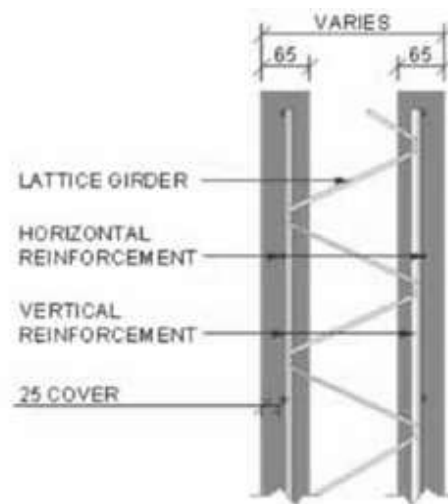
Twin wall section (adapted from www.doppelwand.com)
